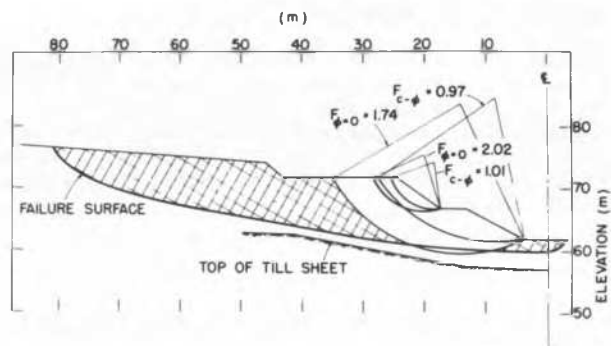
Cross-section of November 3, 1965 failure at station 52 + 70 on the lower canal
